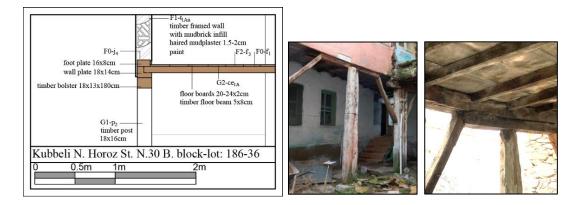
Connection detail 4, section drawing of floor beams located at the same level of wall plate of timber post and connection of wall plate and floor beam wit using half lap joint (Kubbeli N. b. block-lot: 186-36)
